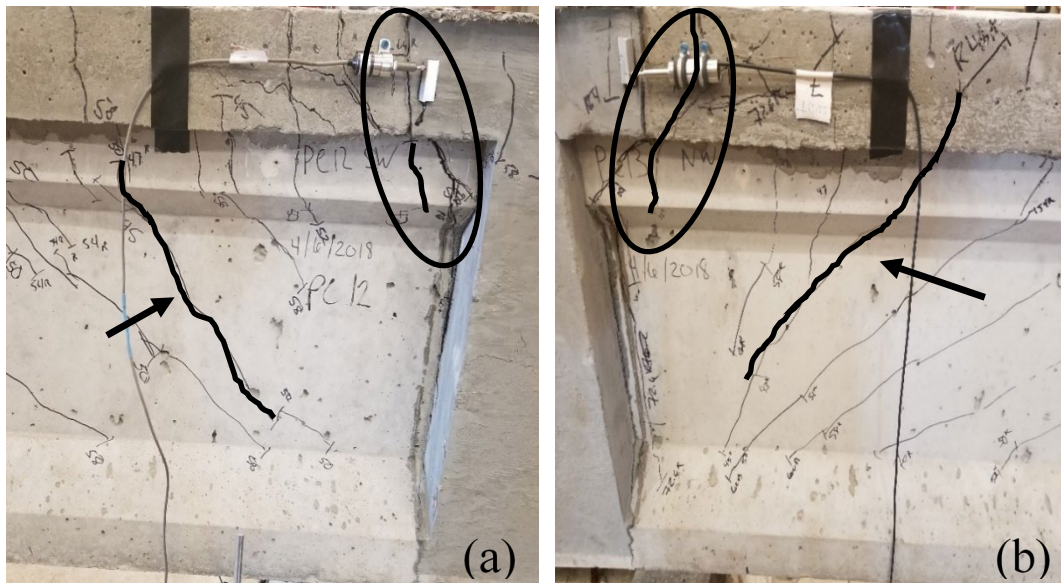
Initial flexural cracking on the NC1-N girder at 43 kips of load and initial flexure-shear cracking on the NC1-N girder at 45 kips of load (a) and initial flexural cracking on the NC1-S girder at 35 kips of load and initial flexure-shear cracking on the NC1-S girder at 43 kips of load (b). Dark ovals indicate the initial flexural cracking near the continuity joint, and arrows point to the dark lines that indicate the initial flexure-shear cracking.
